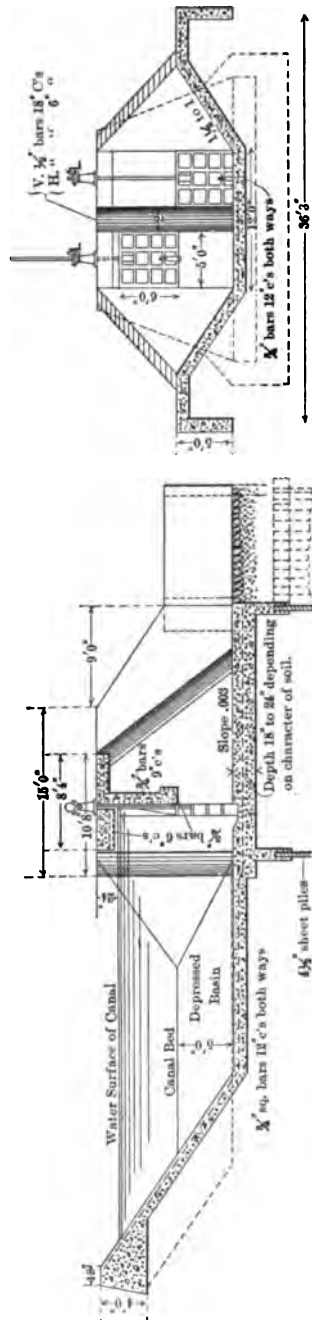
Standard Sluiceway and Sand-Gate, Lower Yellowstone Canal, Montana-North Dakota.
